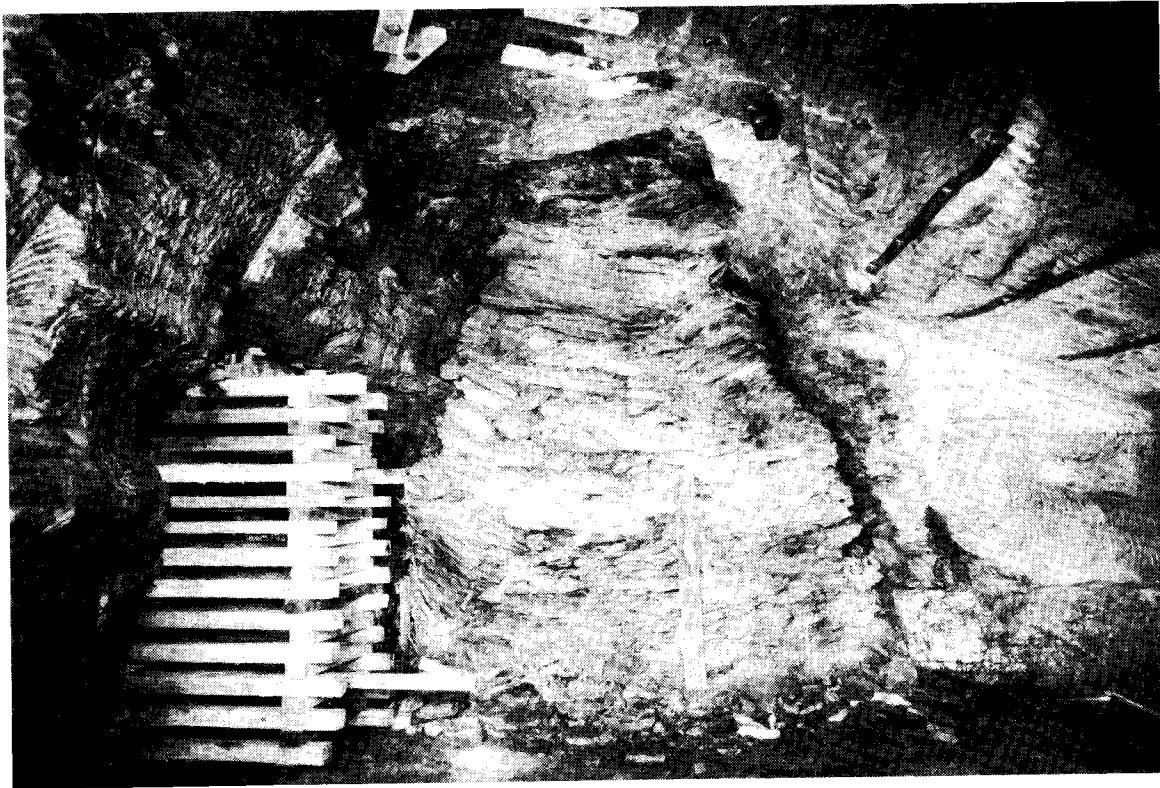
Massive roof fall resulting from unsupported cutter roof failure.
